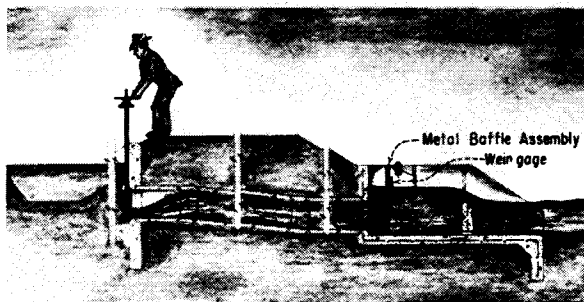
Longitudinal section turnout and weir box. PX-D-31417
